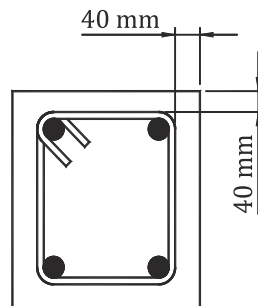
All types of reinforcement of girders, beams, or columns, when not exposed to weather or in contact with ground (Minimum concrete cover: 40 mm)
